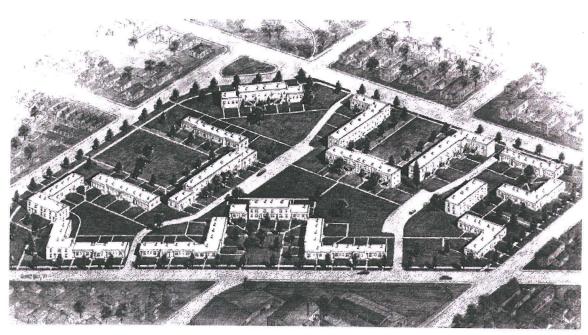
Site plan rendering, Lincoln Gardens. Photo collection, Willard Library, Evansville IN.
